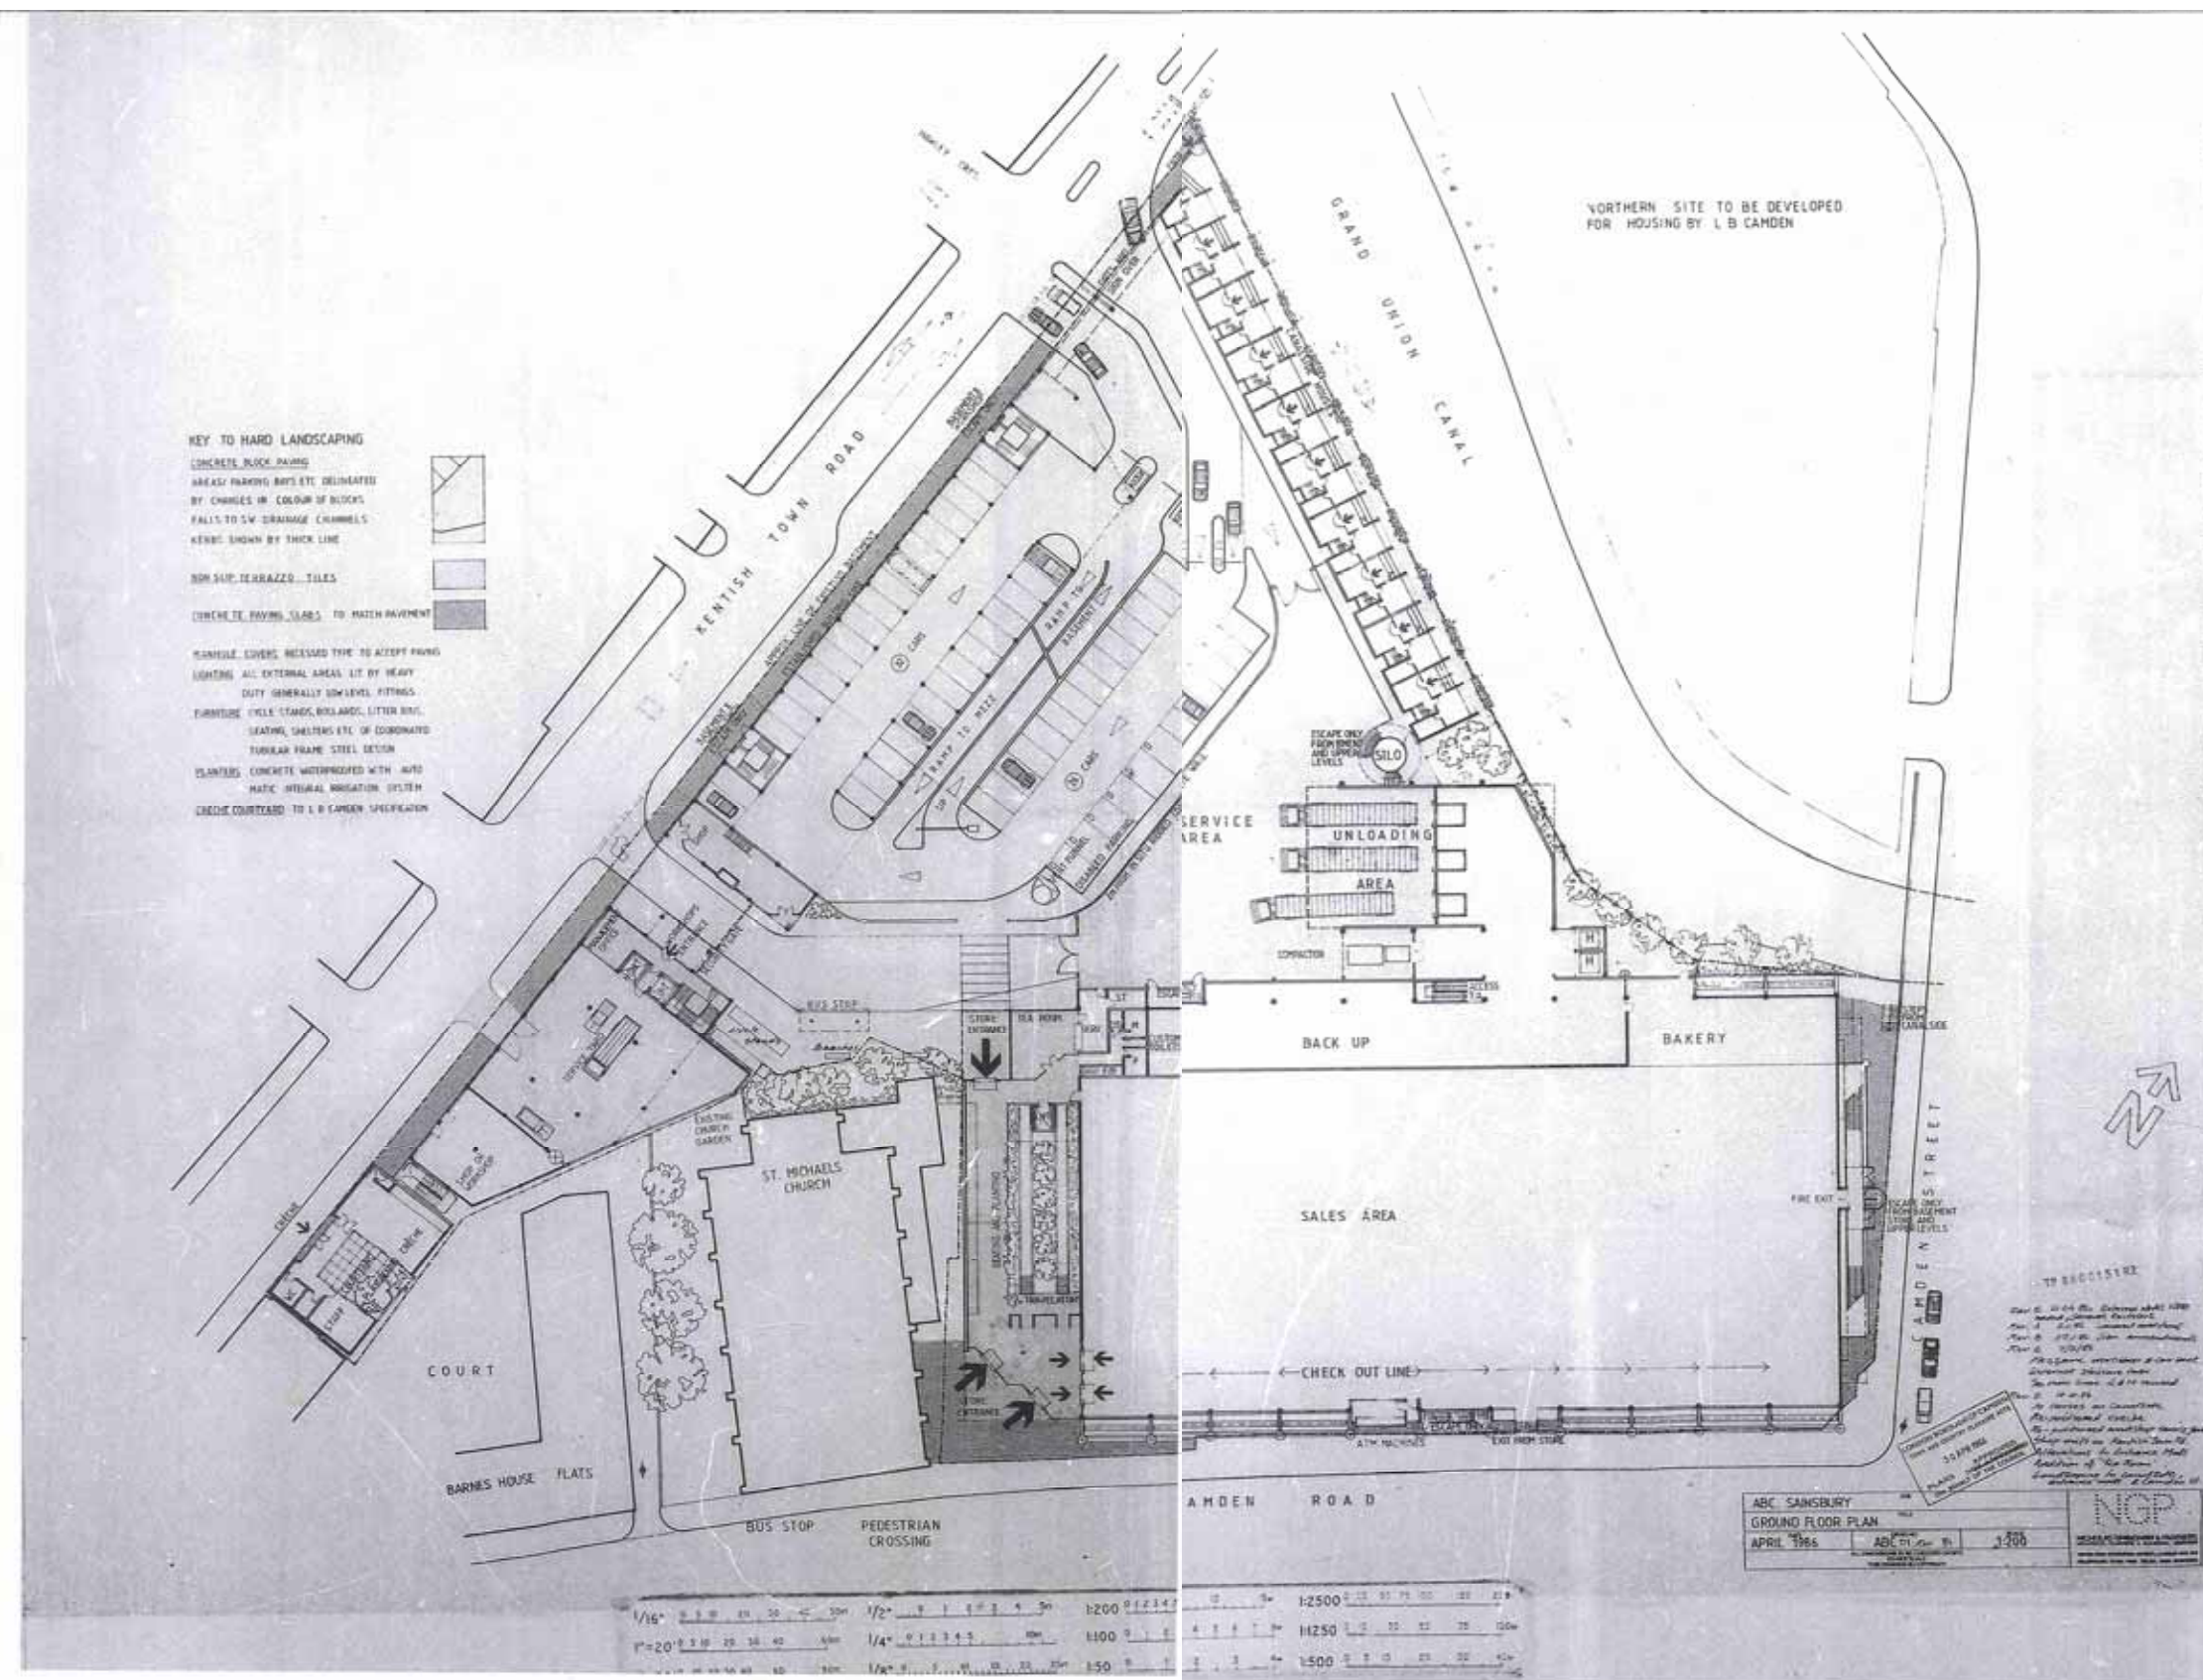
1986: Lower ground floor plan of the proposed Sainsbury's development on the former ABC site
